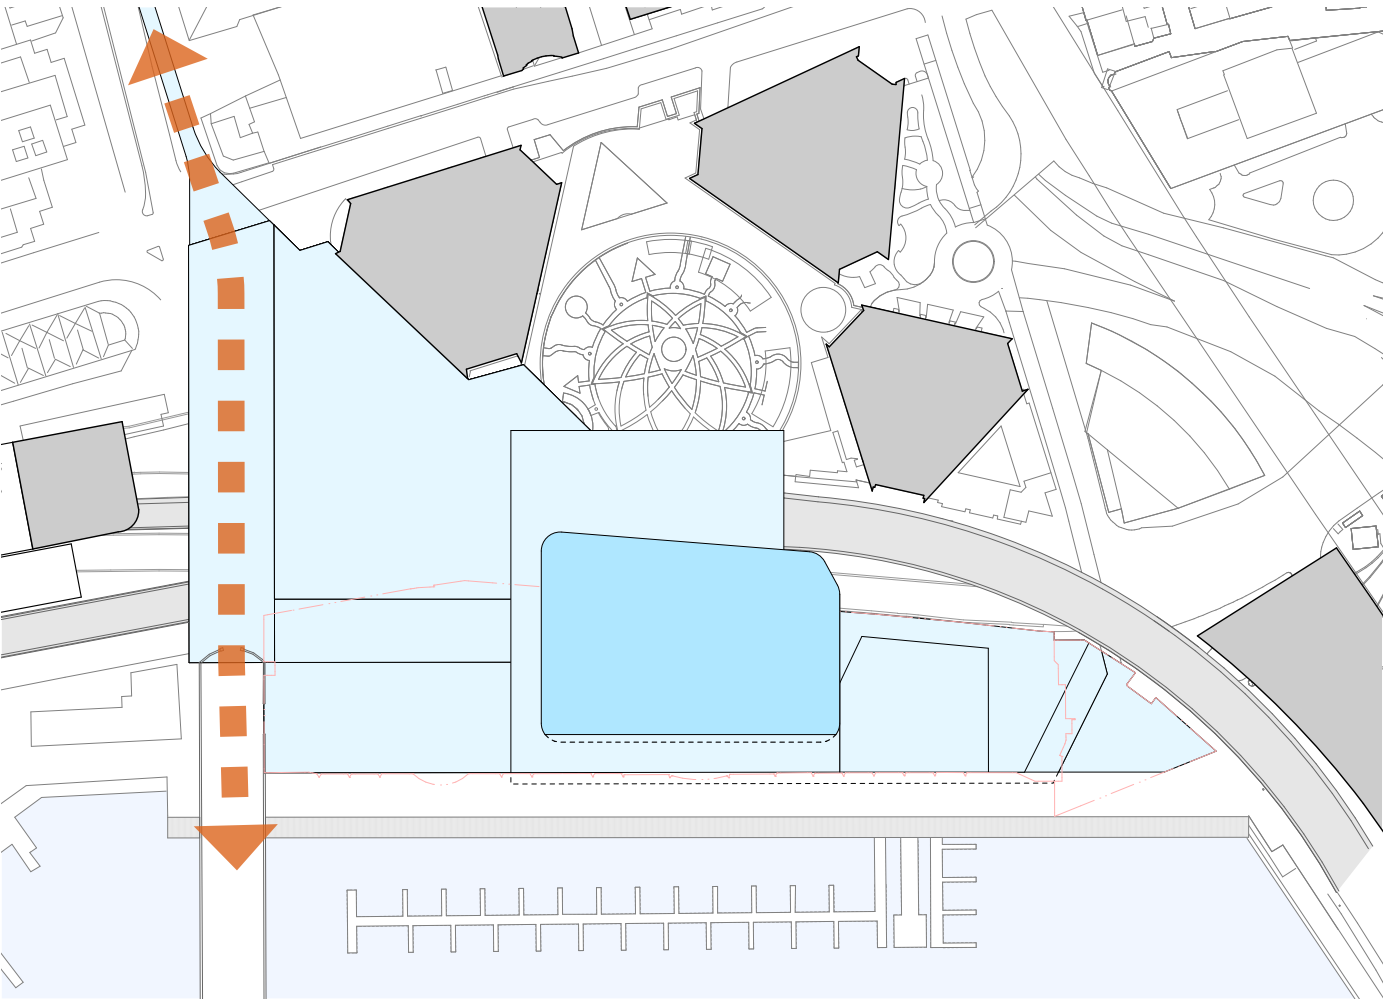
Diagram showing indicative reconnection between Market Street and Pymont Bridge
